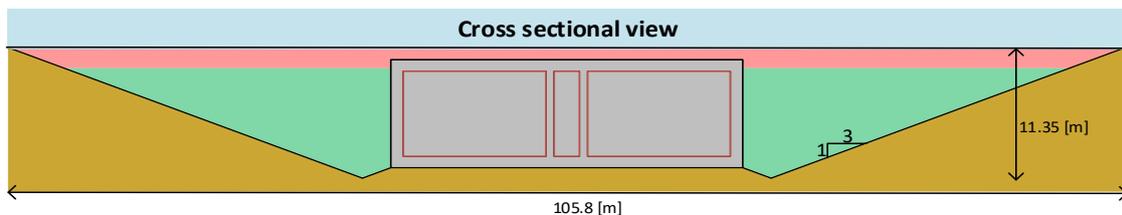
CROSS-SECTIONAL DREDGING SCHEME; CROSS-SECTION VIEW
